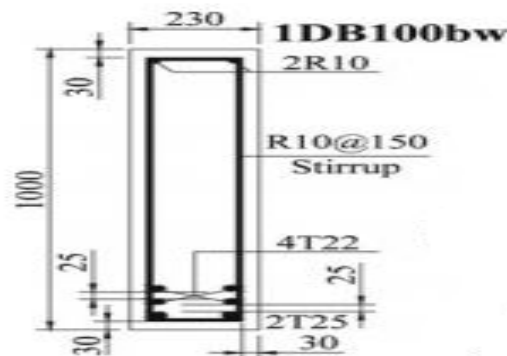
(Ning Zhang, 2007) RC Deep Beam Cross-Section.
